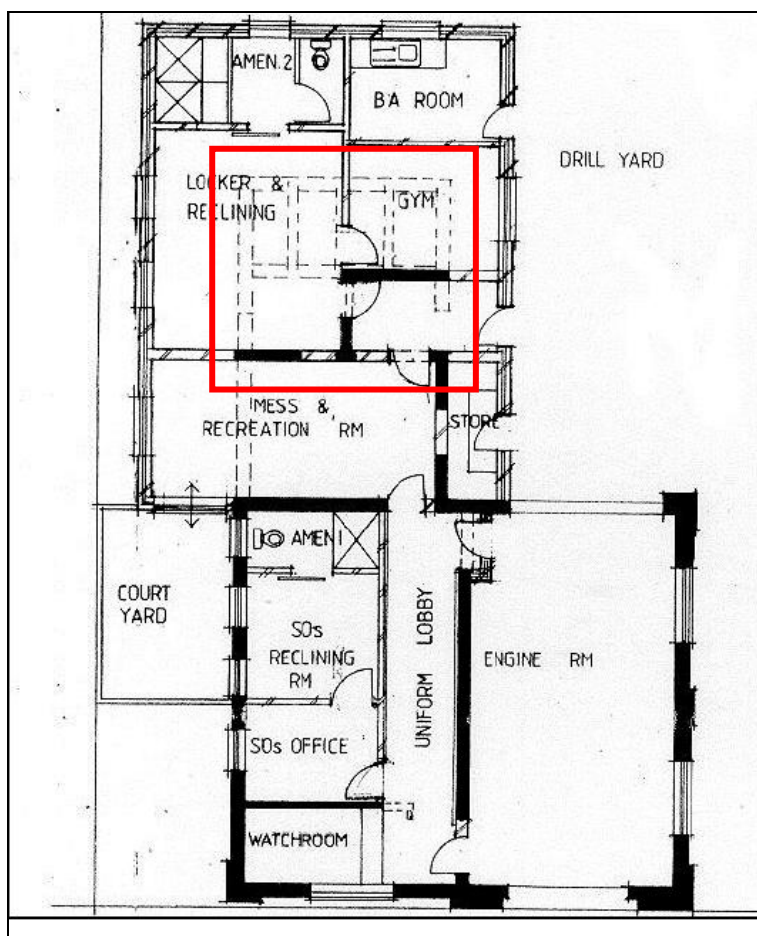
Proposed alterations and additions, c. 1980s. The works do not appear to have been executed, however, the plan shows what is assumed to be the early additions to the western end of the rear wing and variation from the original plan.
